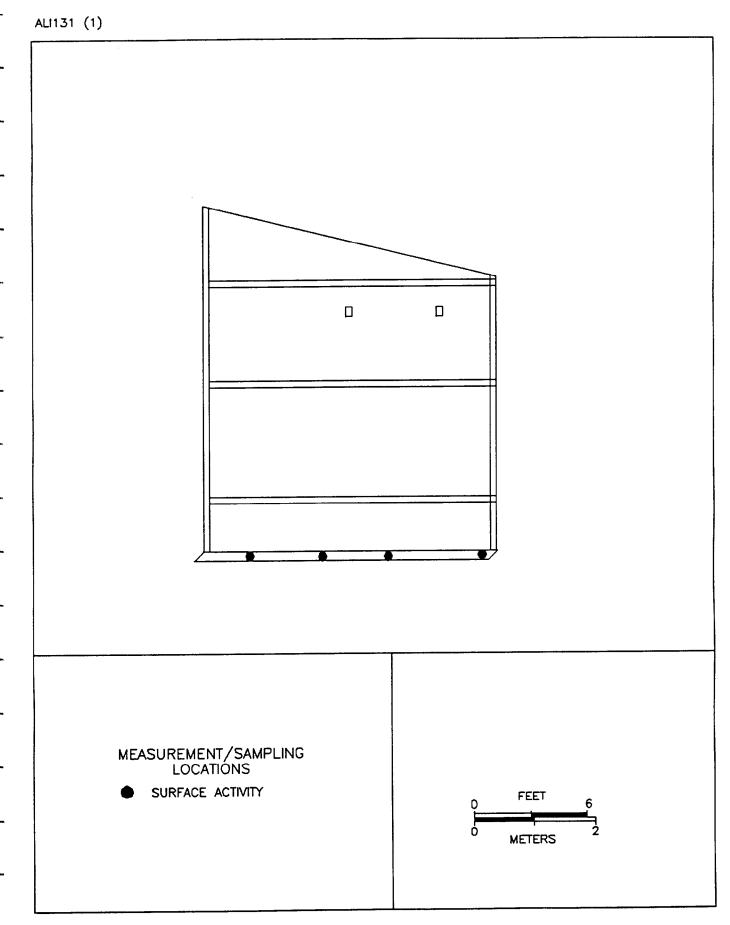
Building 8, Room B, North Wall — Measurement and Sampling Locations
